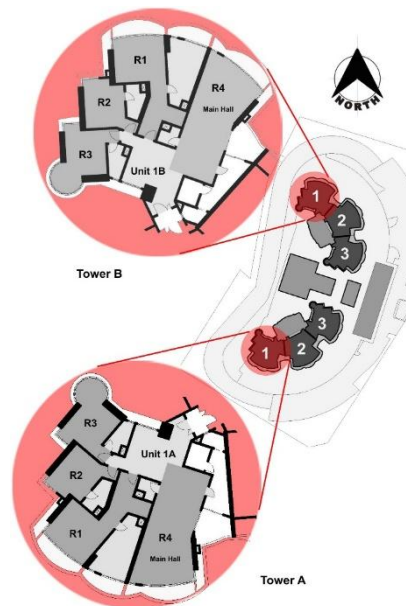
The View building typical floor plan, Unit 1A & 1B at tower A & B.
